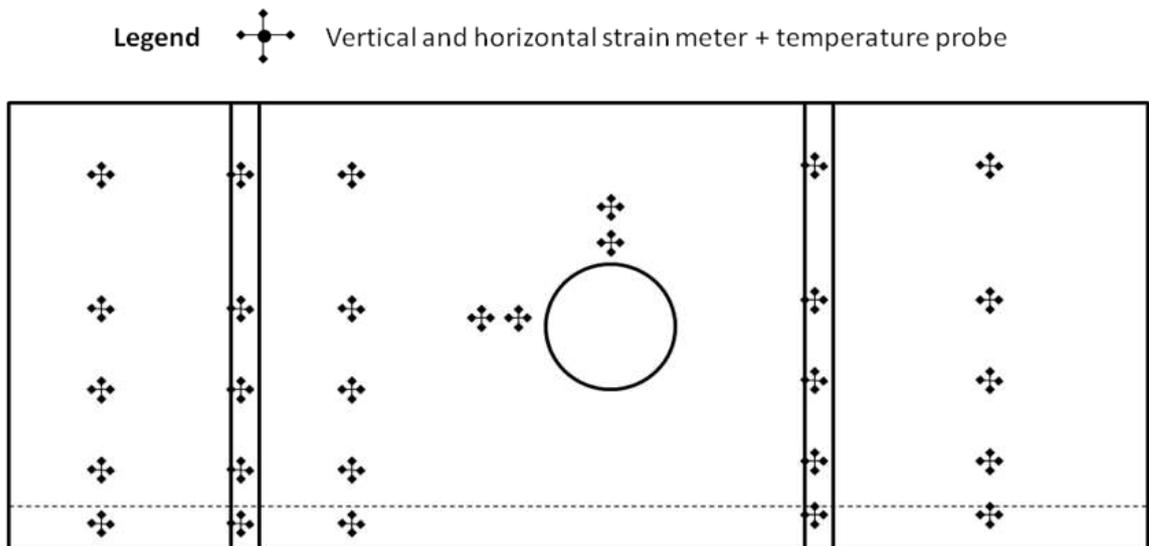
Typical embedded sensors layout in the dome (top view)
